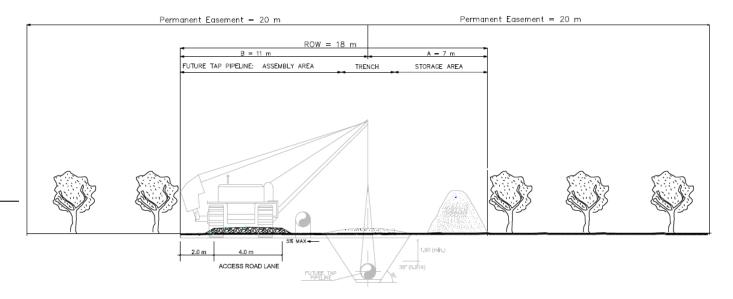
New Access Road typical cross section within "future" pipeline ROW
